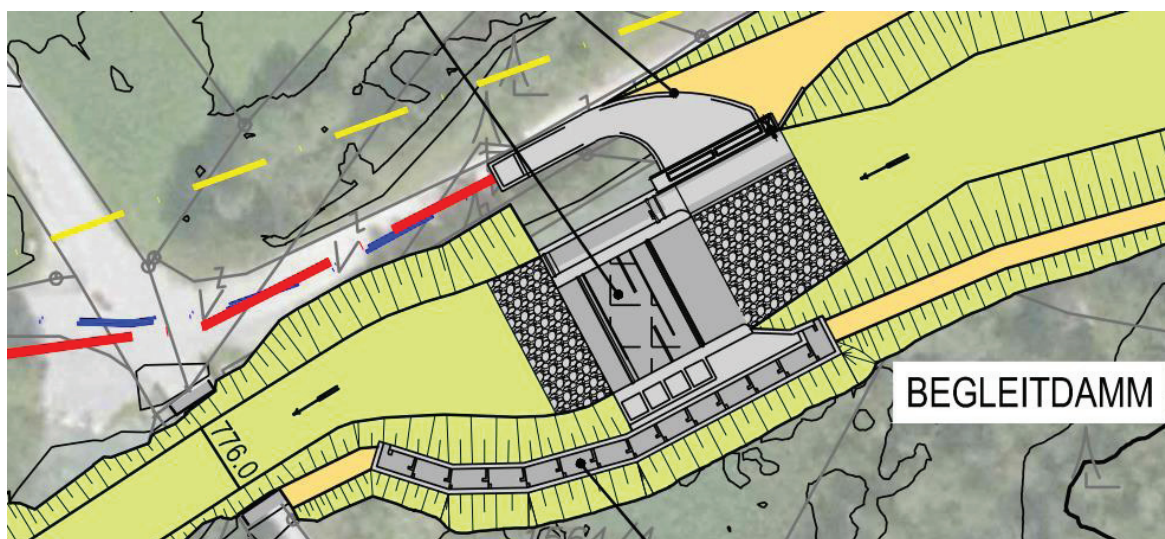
Plan view of new weir and new fish passage. Flow from upper right to lower left.
